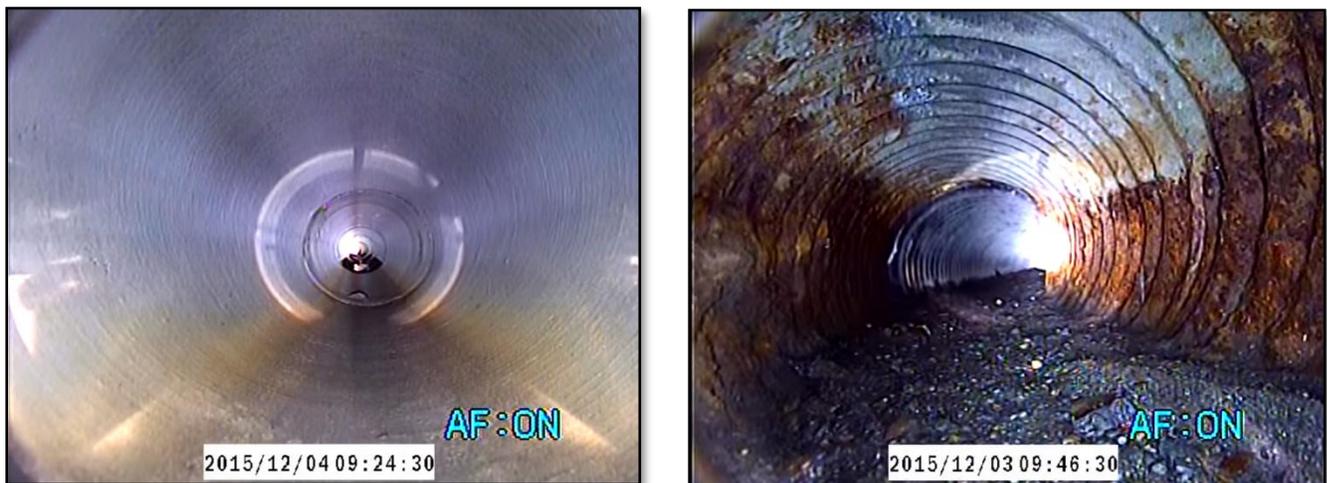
Example of Inspected Drain Pipe in Good Condition (left) and Fair Condition (right)
